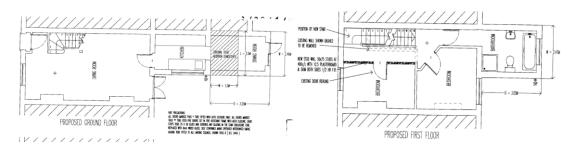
No. 26 Floor Plans Consented via 06/2941/PS192
